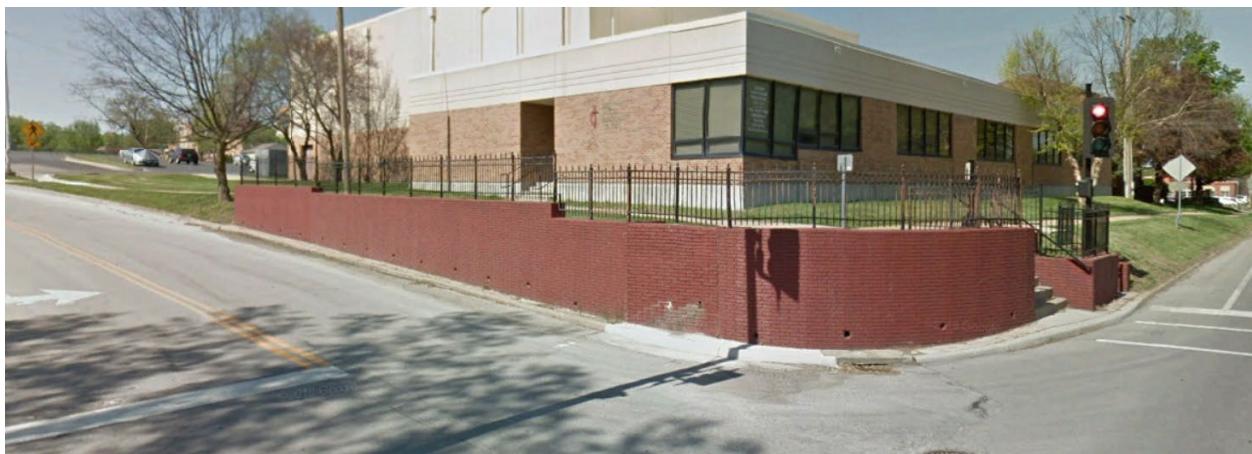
Existing retaining wall in the northeast corner of 2nd Street and SE Main Street
